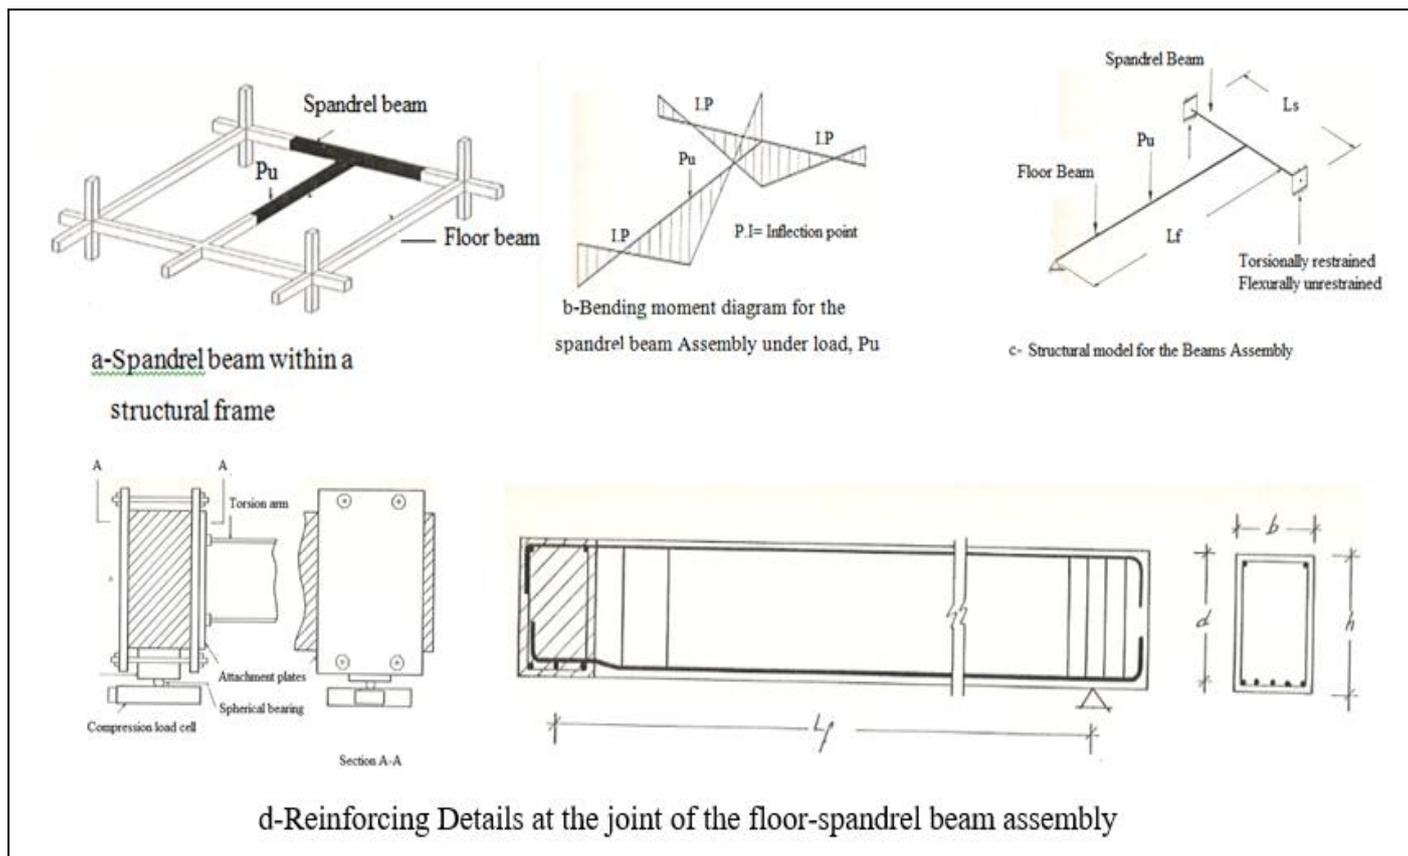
Typical Details for the Tested Spandrel-Floor Beams Assembly [11].
